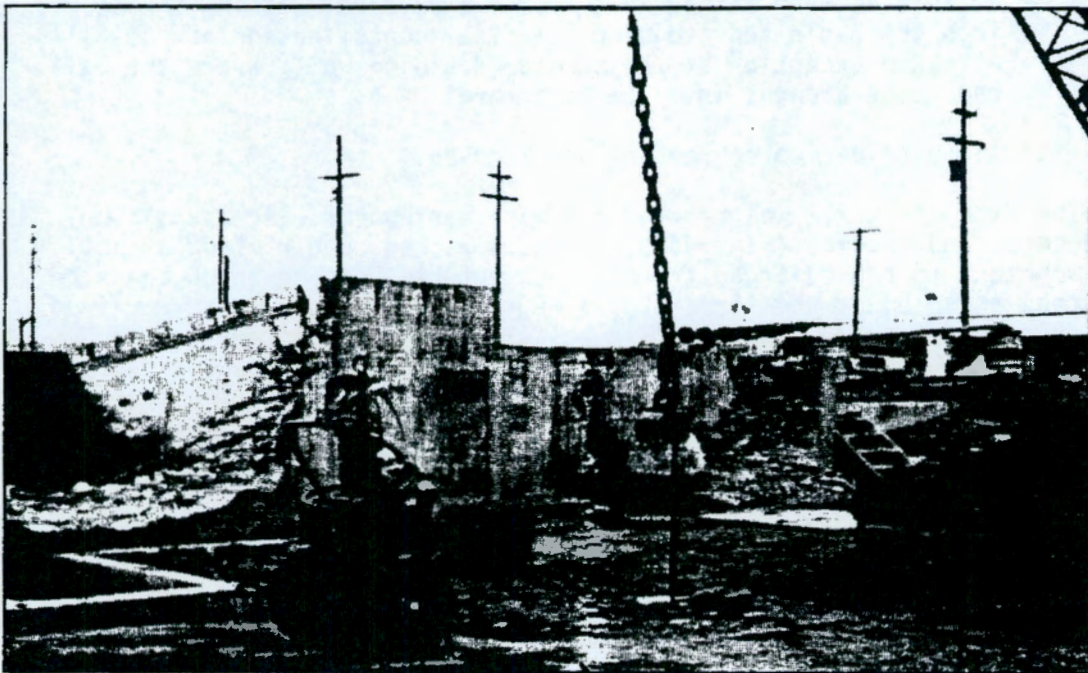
The 204-S Pumphouse and Basin Demolition. Steel reinforcing bars were cut with a welding torch (foreground) after demolition of the concrete.
